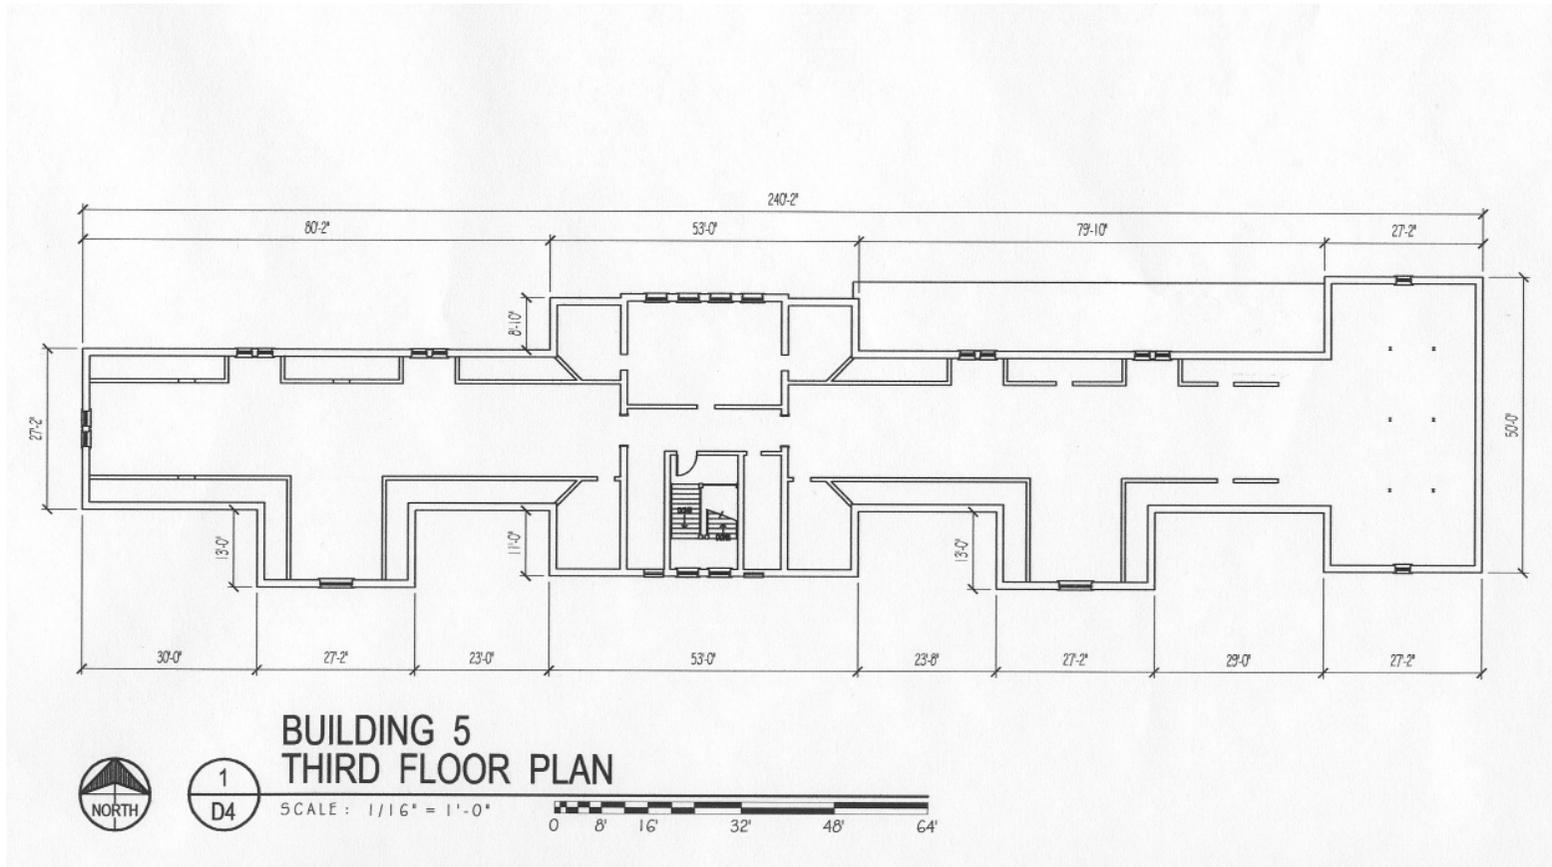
Third (attic) floor plan of Building No. 5 showing existing conditions (Walton and Associates 2003).
